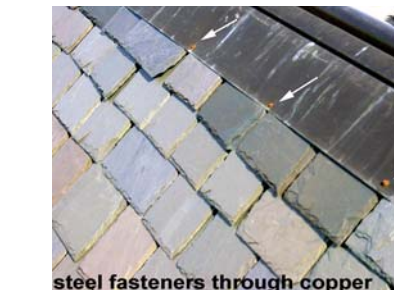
Steel fasteners on copper, as shown, will deteriorate.
